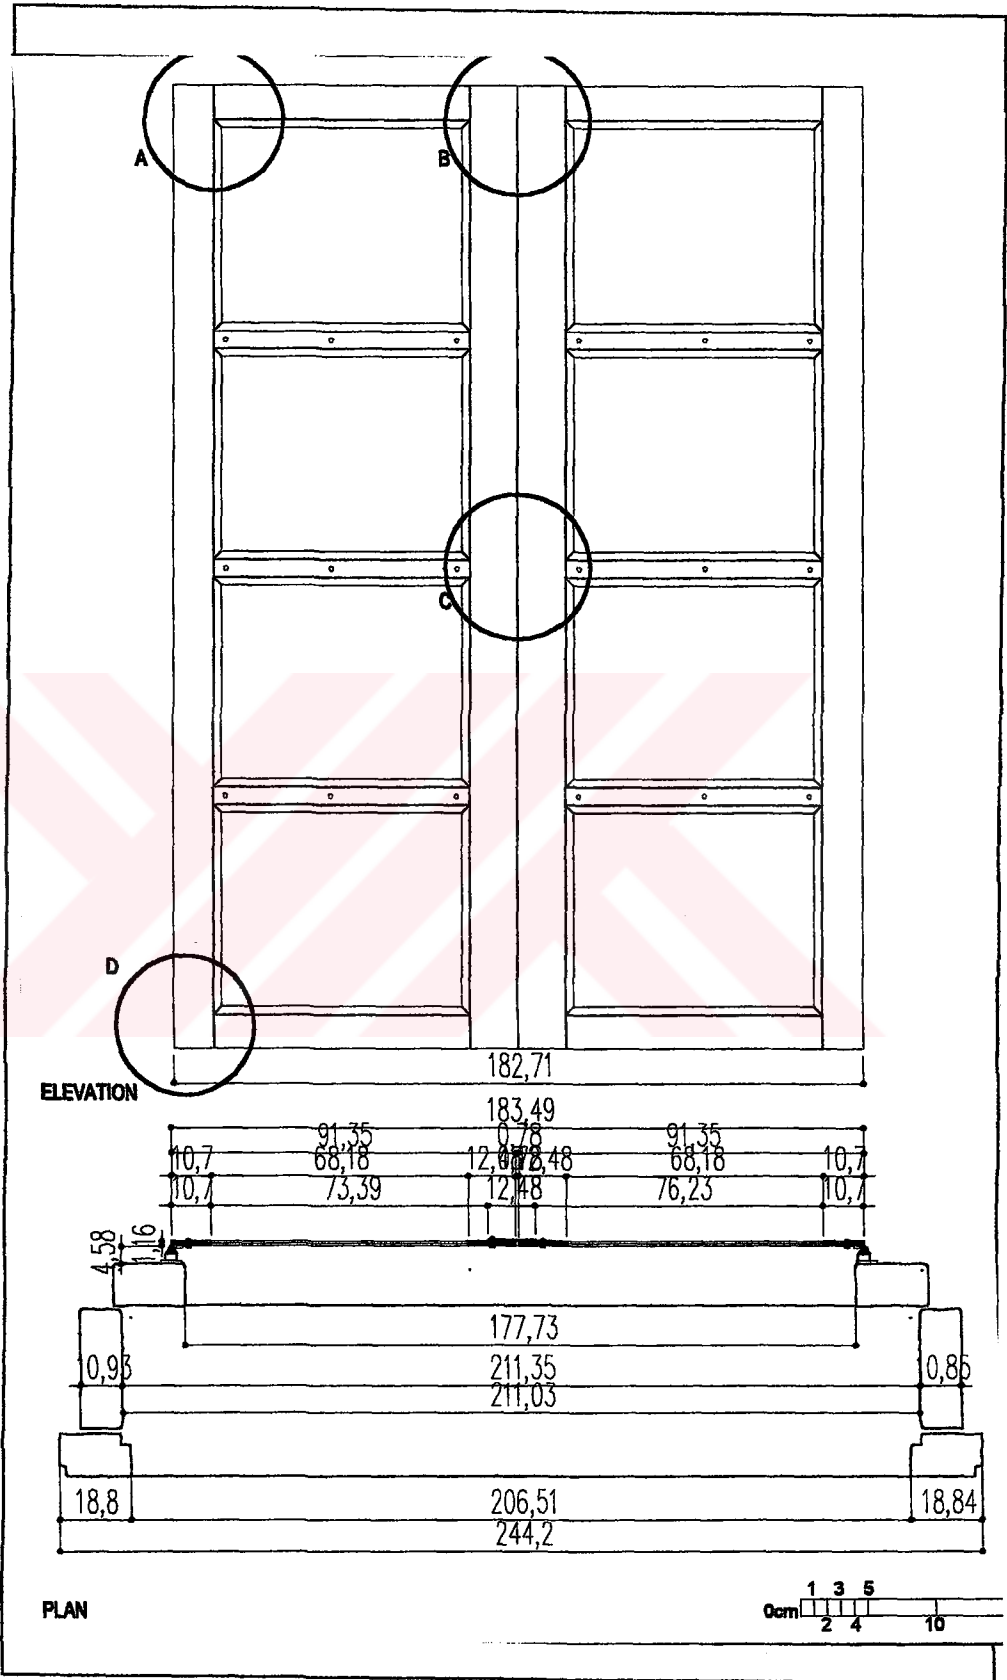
DM02 İzmir Caddesi No:1 – Exterior Elevation
